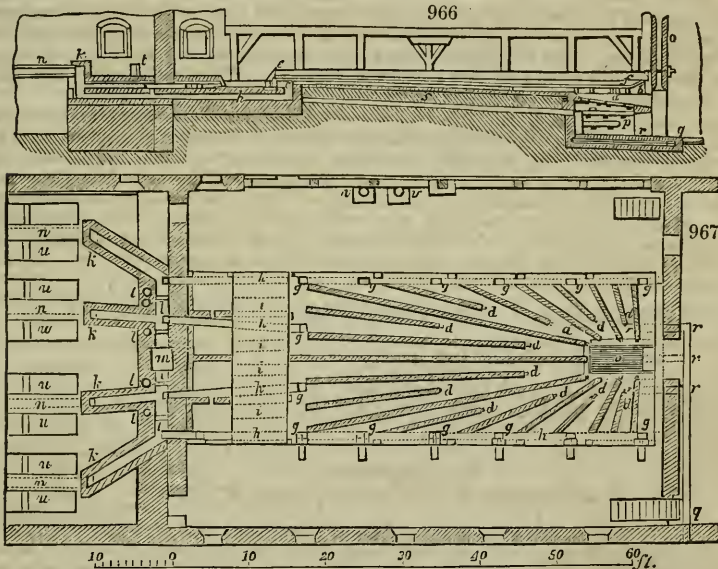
, 966, 967 represent the construction of a salt-pan, its furnace, and the salt store-room of the works at Dürrenberg; fig. 967 being the ground plan, fig. 966
